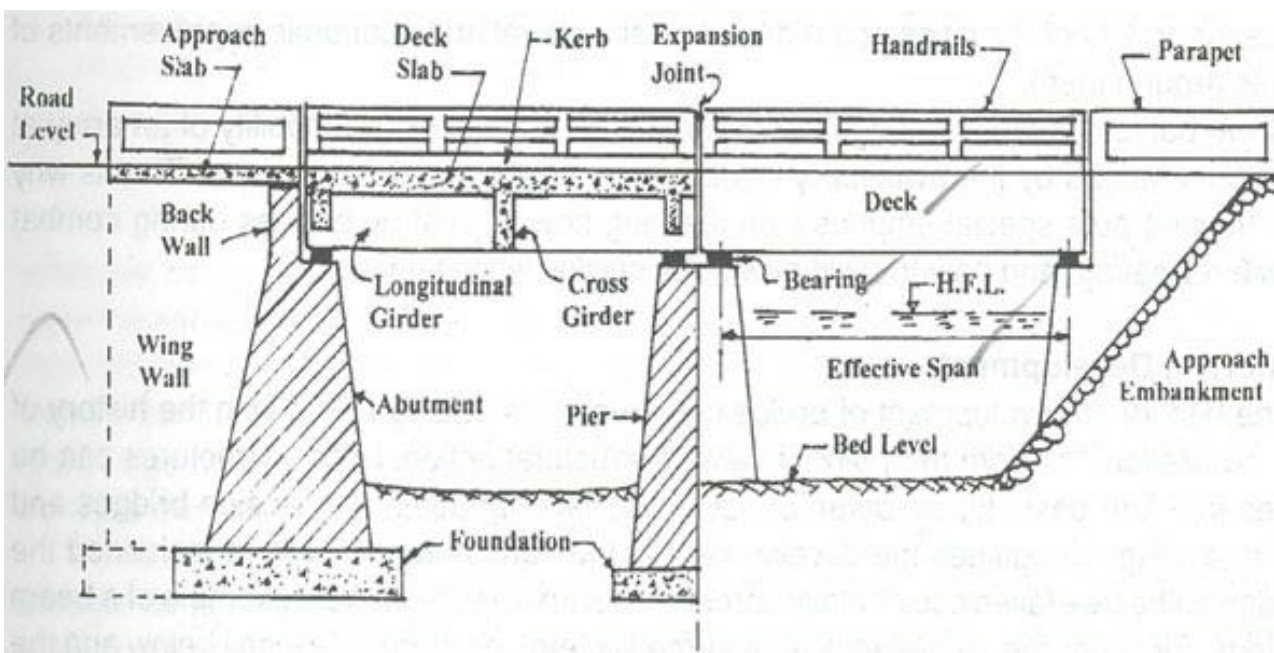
Bridge terminology [7] from Sketchup3DConstruction.com
